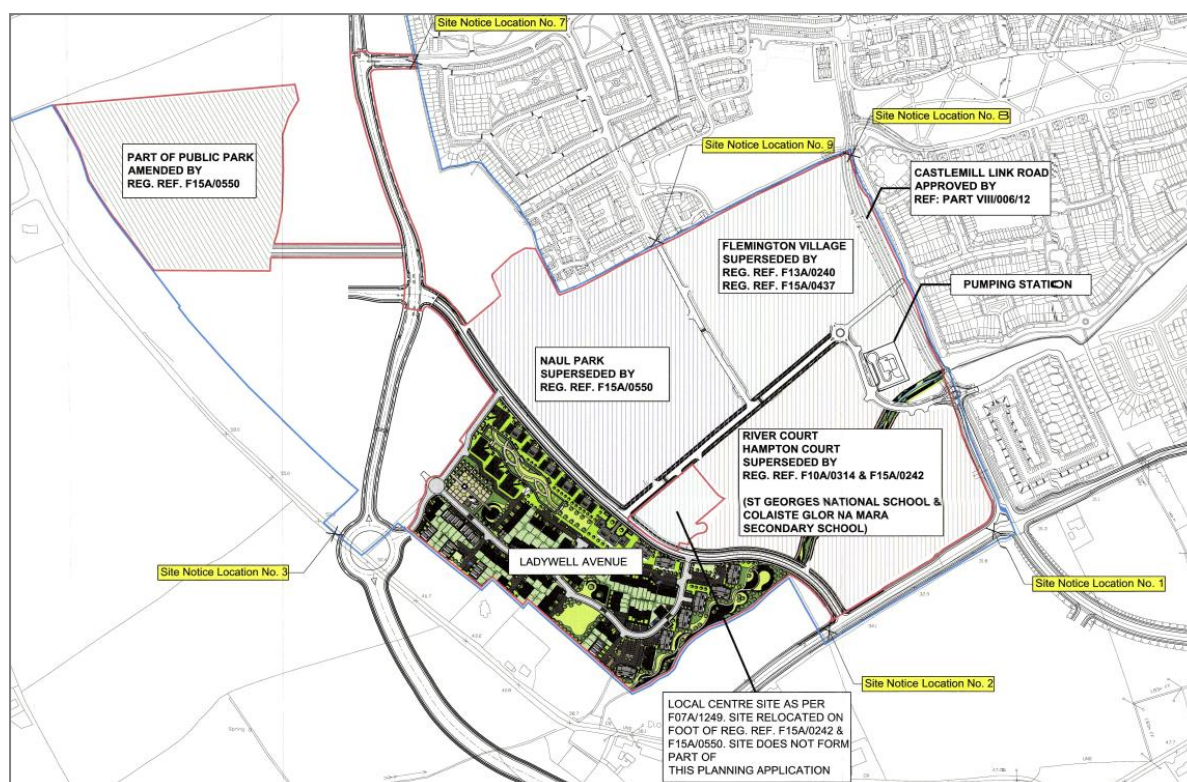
Site layout plan as submitted to Fingal County Council under Reg. Ref. F17A/0372.
